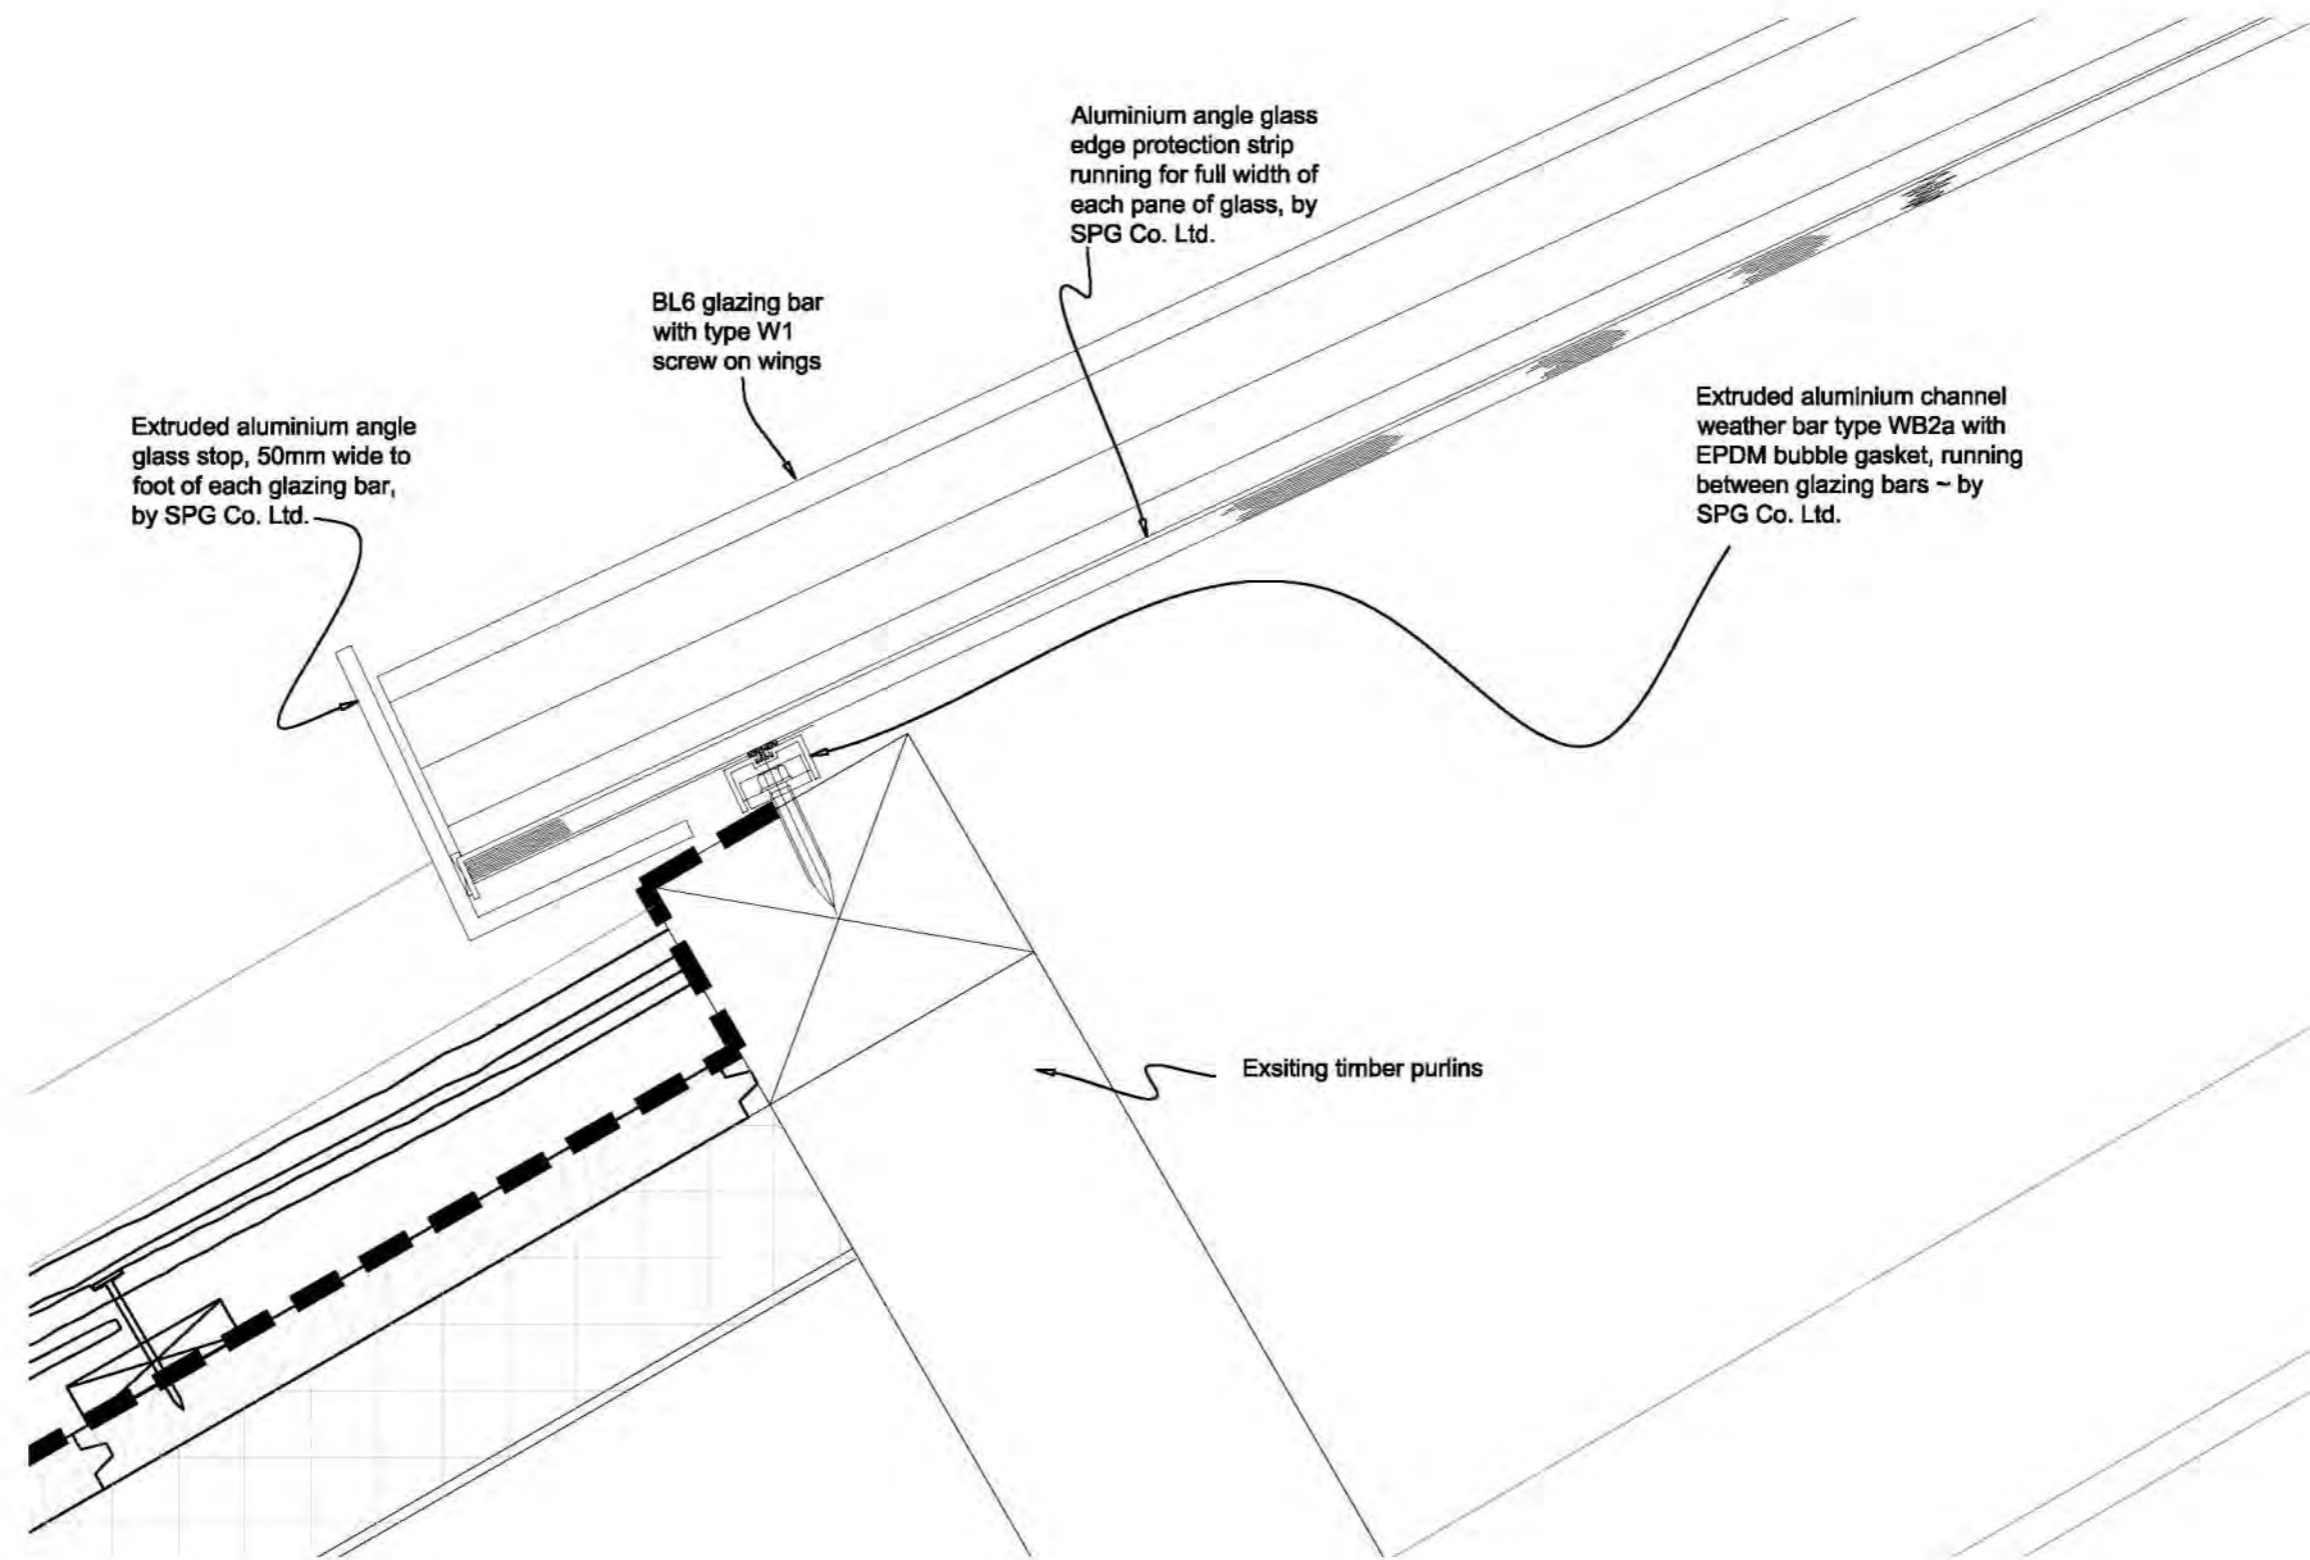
Proposed detail at cill of replacement patent glazing to roofs
